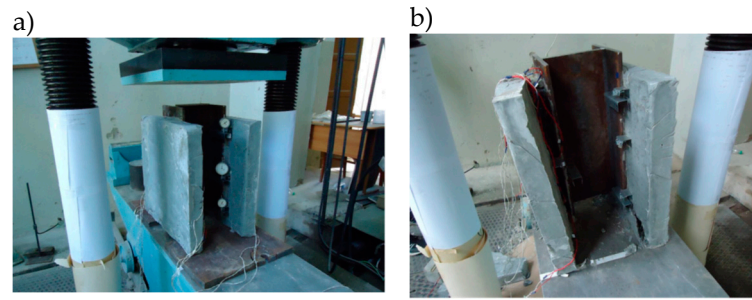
Steel-reinforced concrete prisms in installation (a), and after testing (b).
